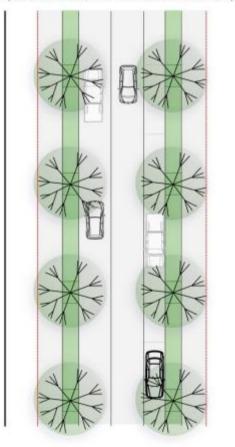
Local Road 1 (Larool Crescent, Barrawarn Place and Gay Street)
